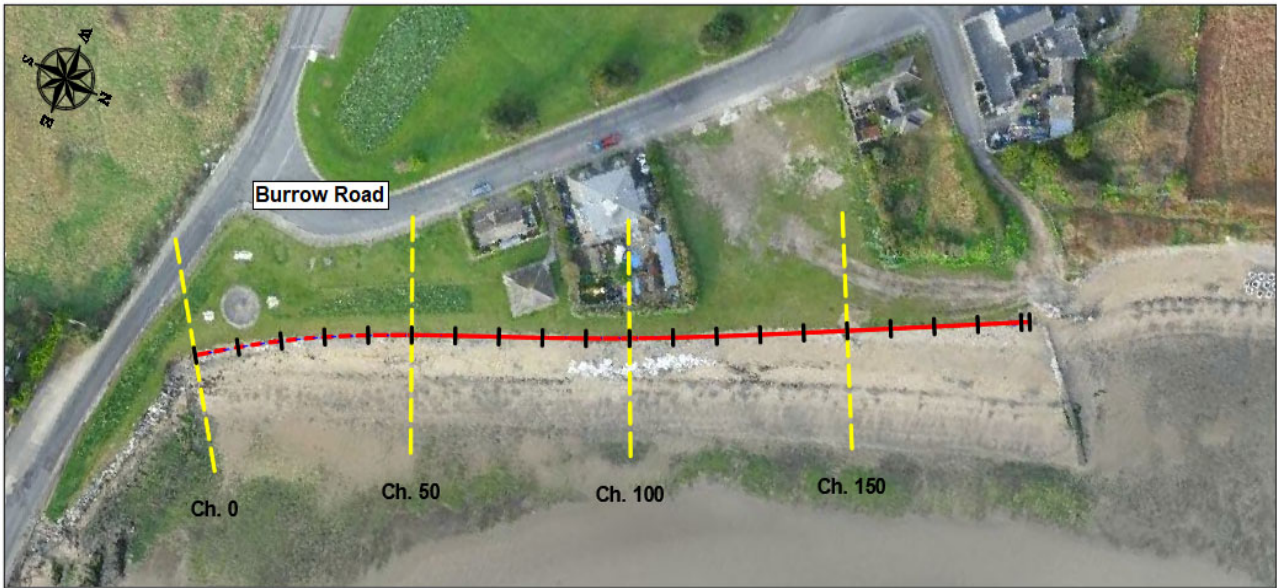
Location and alignment of the sheet piling at Burrow road
